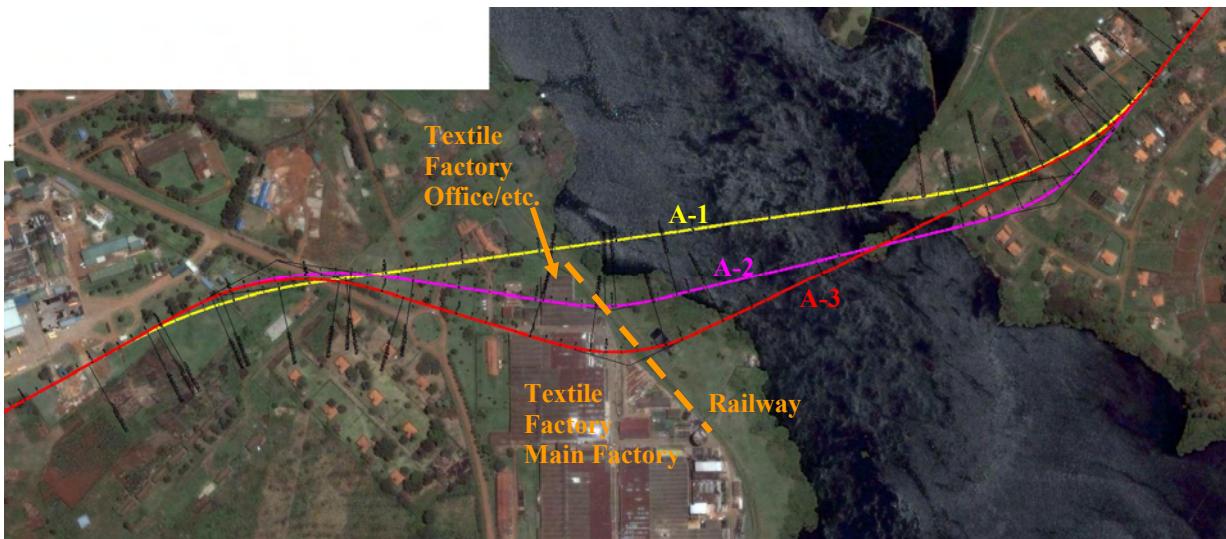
Alignment and Bridge Location Alternatives A-1, A-2 and A-3
